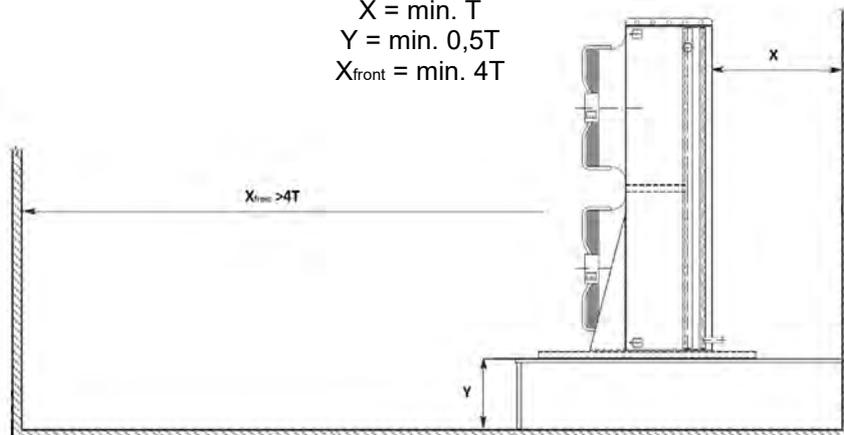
KAB Vertical unit next to a wall on raised floor
